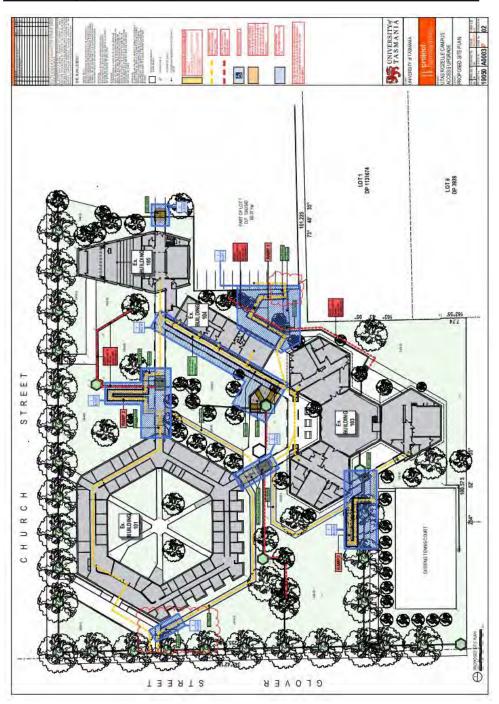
Proposed Site Plan prepared by Project Hemesphere.
